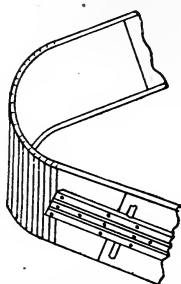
Completed Wreath-Piece Removed from Cylinder.
